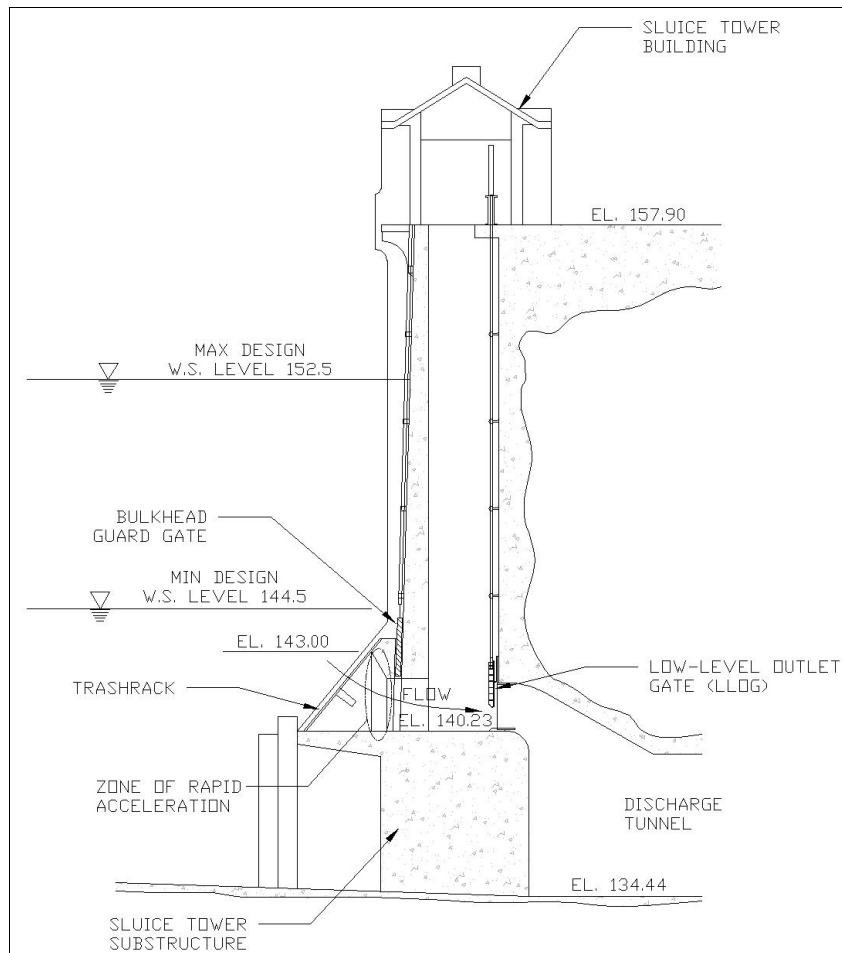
Cross-Sectional View through the Existing Sluice Tower.
